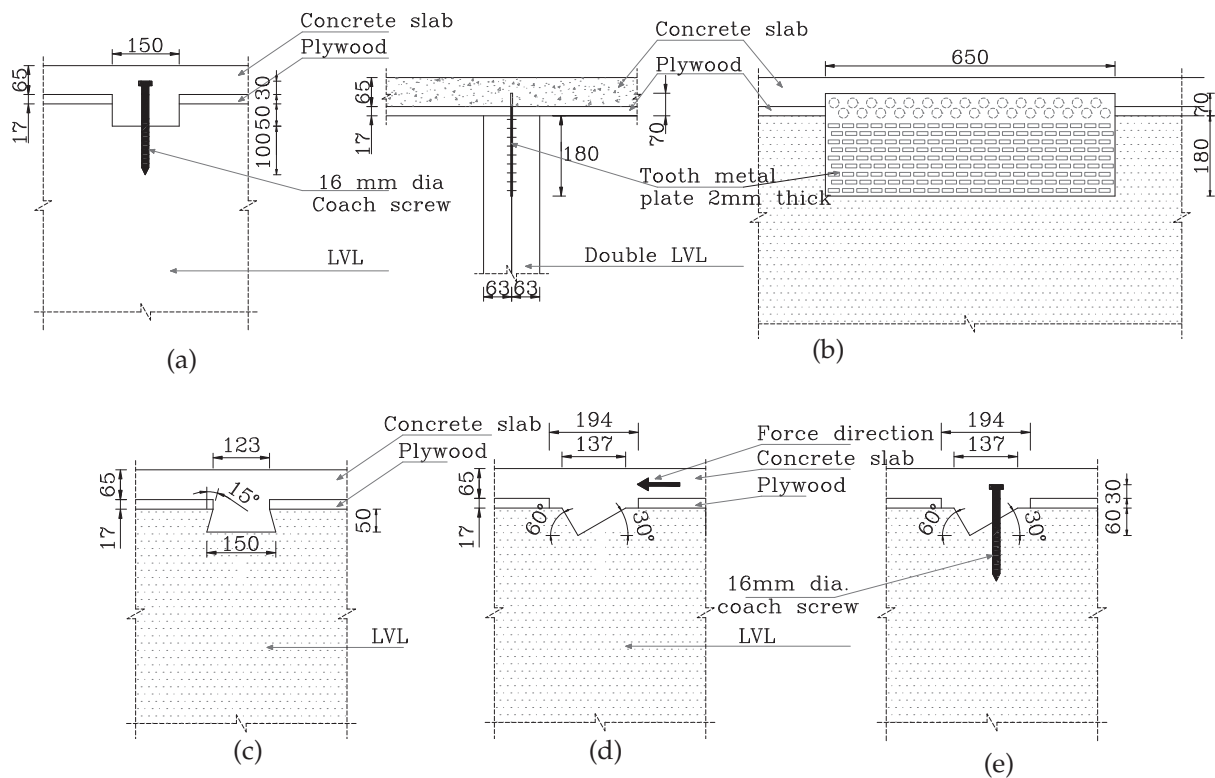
(a) Typical notched coach screw connection, (b) section and elevation of toothed metal plate specimen, (c) dovetail notch, (d) triangular notch and (e) triangular notch with coach screw (dimensions in mm).
